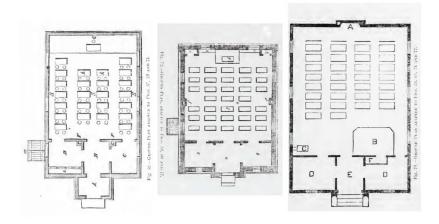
Selection of plans from Hodgins' 1876 The School House, showing three possible configurations for a simple one-room Schoolhouse (The School House: Its Architecture, External and Internal Arrangements).
